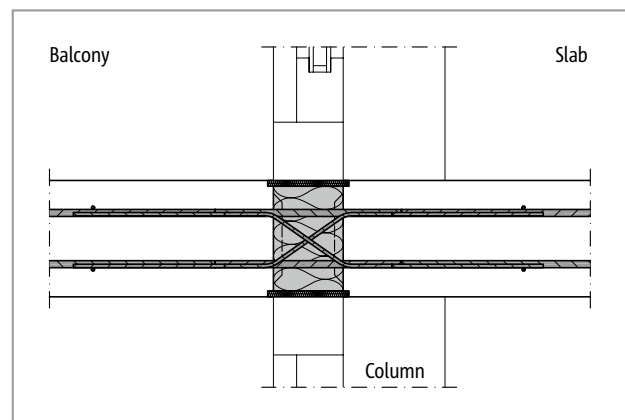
Schöck Isokorb® XT type D: Two-way spanning
